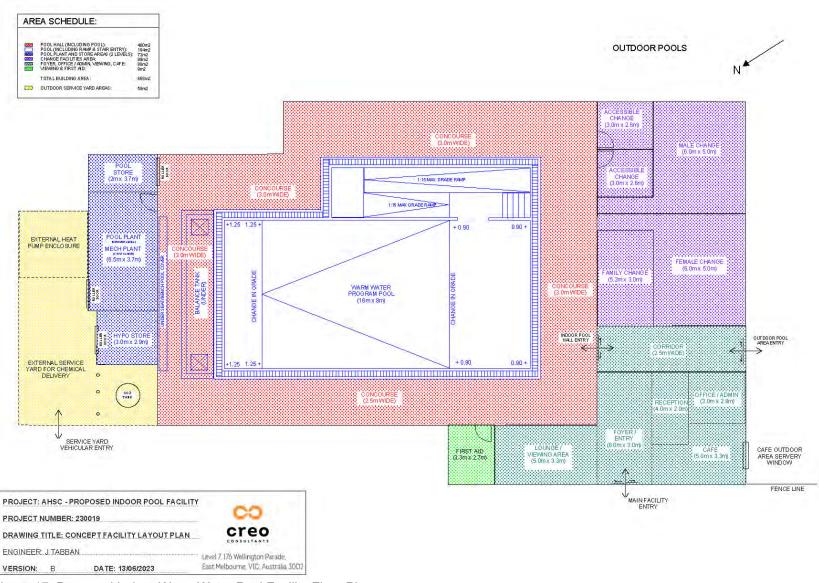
Proposed Indoor Warm Water Pool Facility Floor Plan
